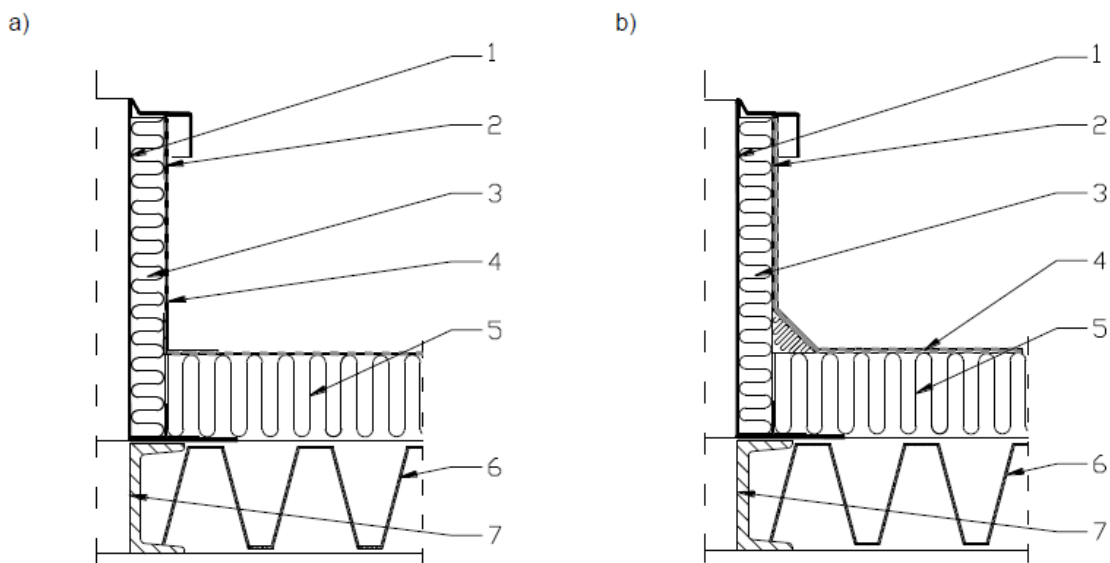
Steel base on reinforced concrete board: a) membrane flashings, b) felt flashings.
